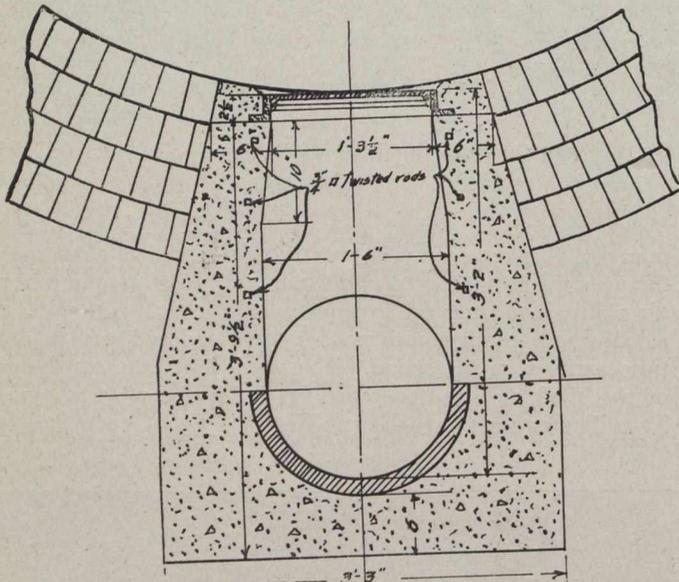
Type of Manhole on the 18-inch Vitrified Pipe Sewer.
